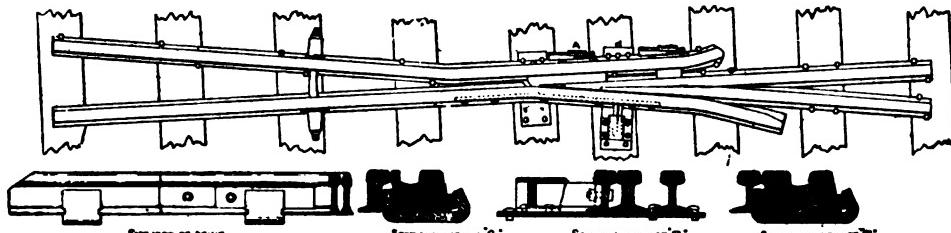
PENNSYLVANIA STEEL CO'S. KEYED SPRING FROG.
